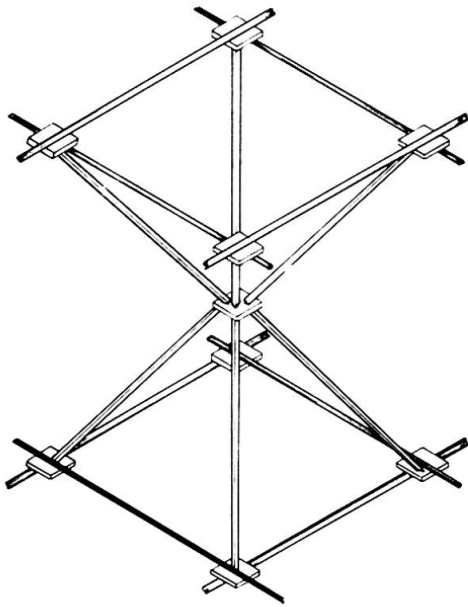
Basic Modular Element of a Rural Spatiostructural Bridge (Sketch)
